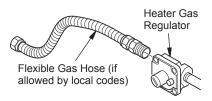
Attaching Flexible Gas Hose to Heater Gas Regulator
